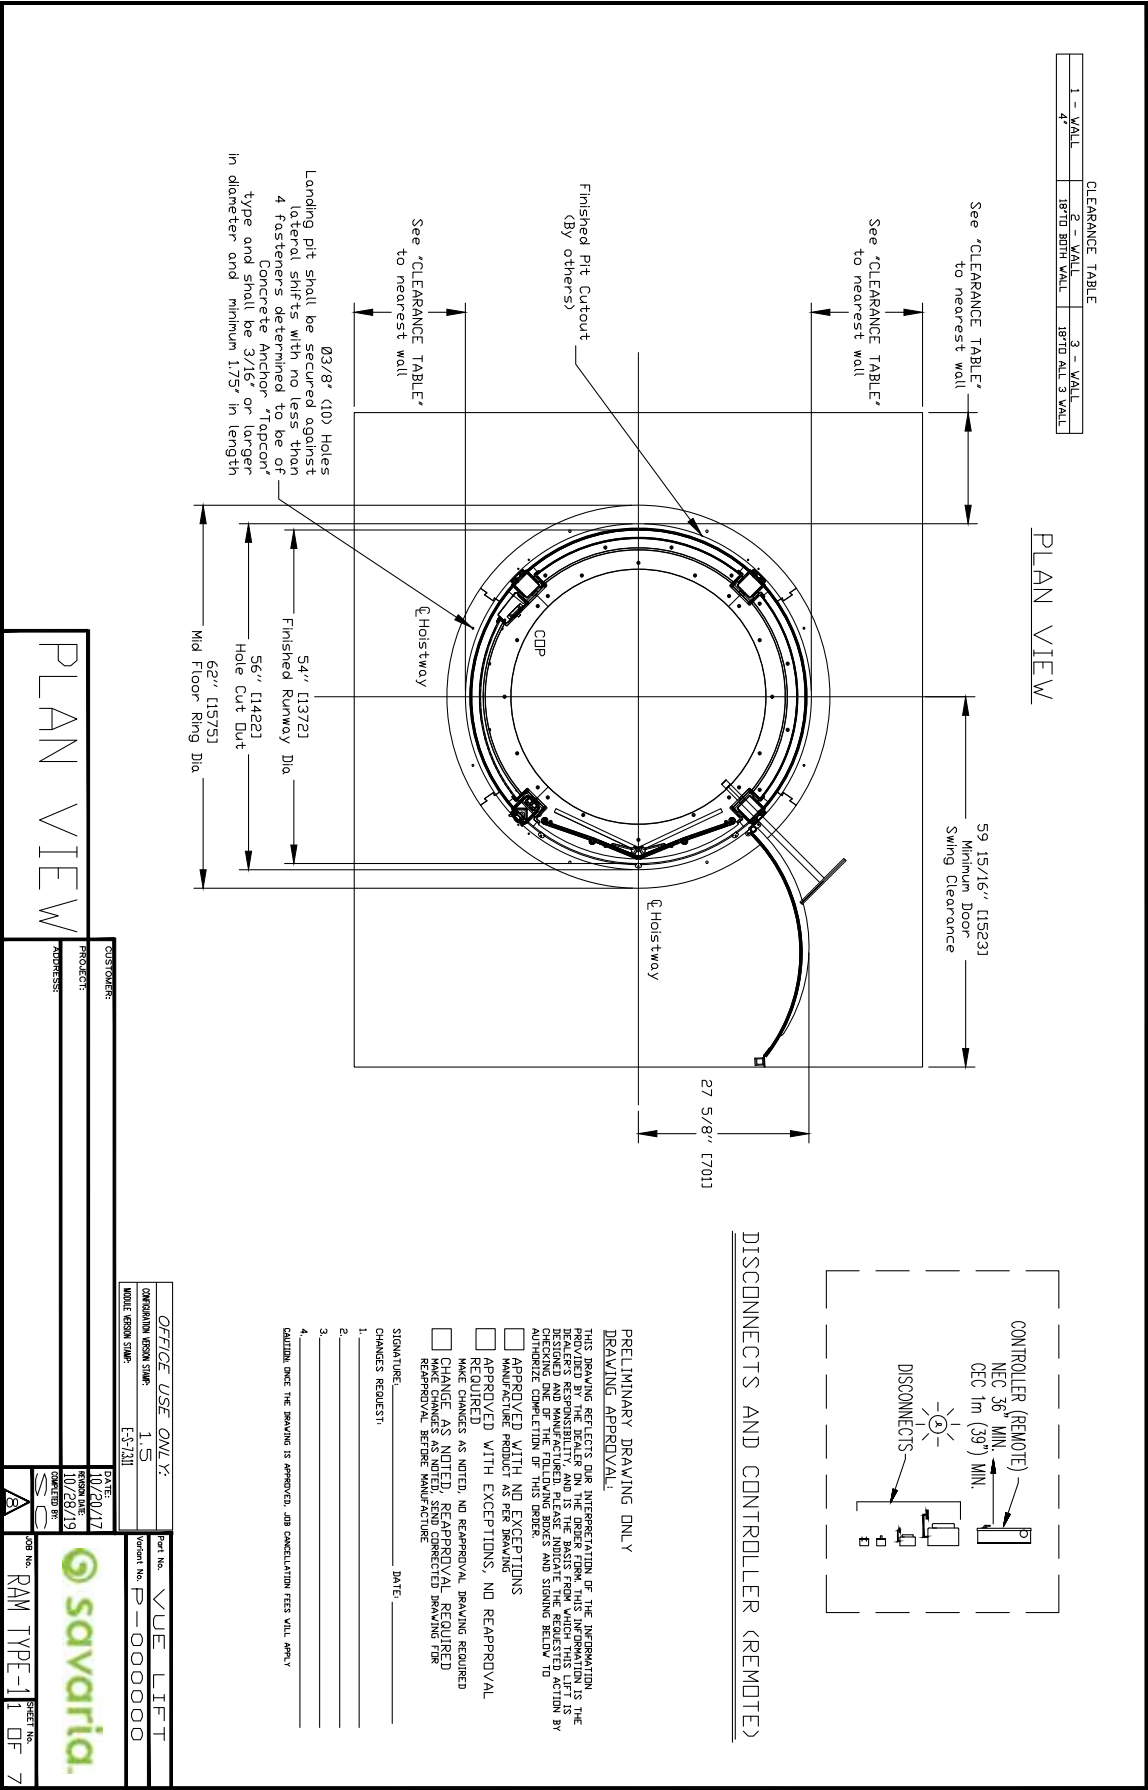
Pit/bottom floor/thru-floor view (RAM)
